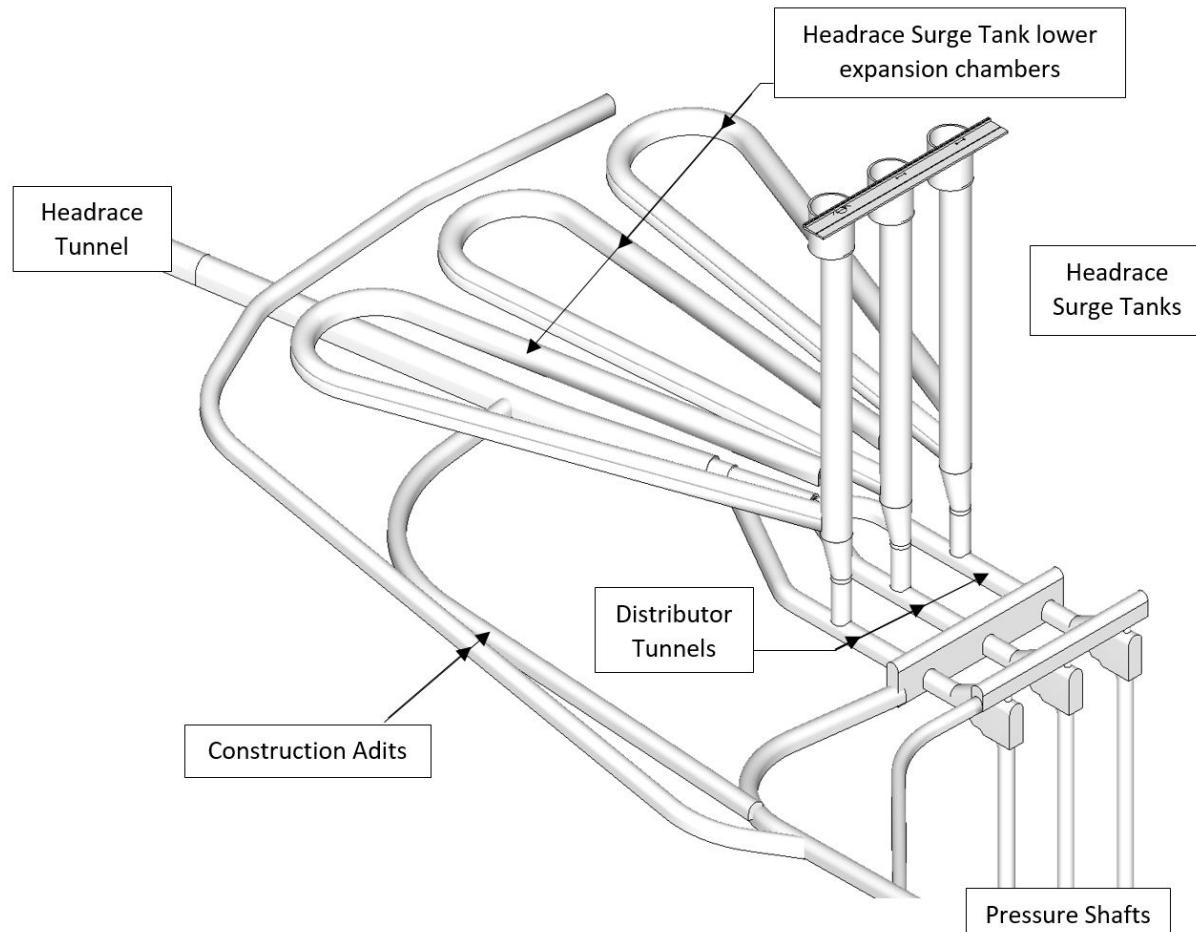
Headrace Surge Tank area, lower expansion chamber tunnels and construction adits are not shown for clarity.
